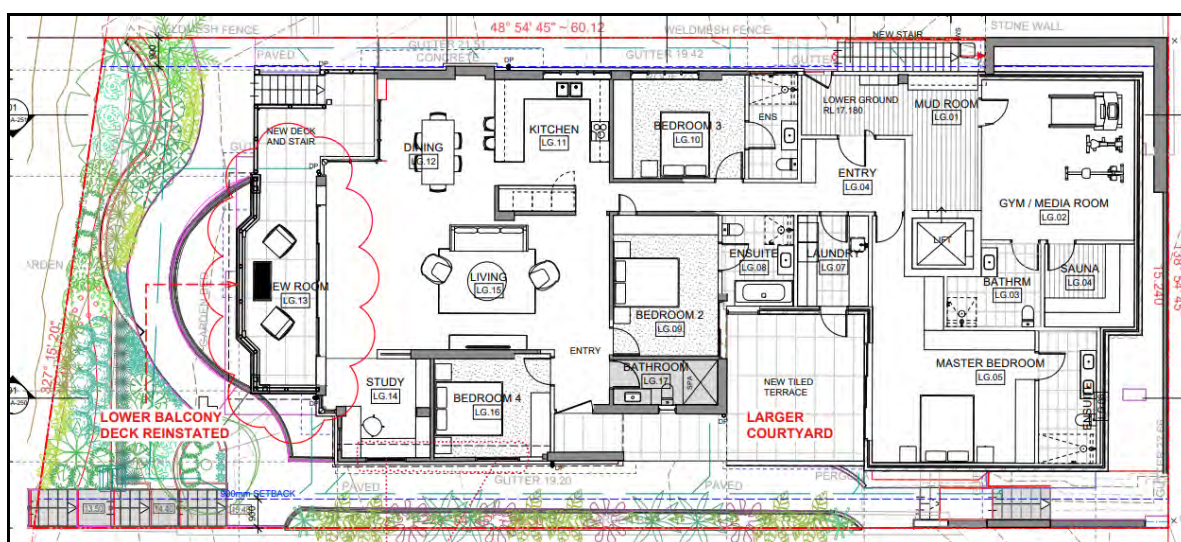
Proposed Lower Ground Floor Plan, DA-A-100 Rev L
